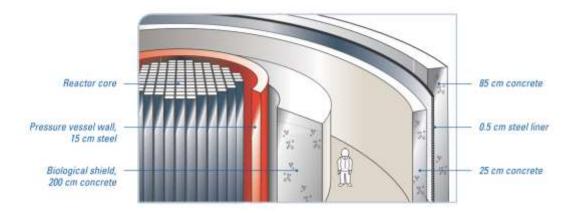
Cross-sections of the containment wall and pressure vessel wall made of concrete and steel.
